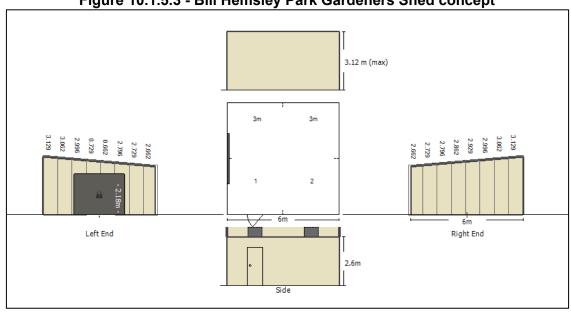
Bill Hemsley Park Gardeners Shed concept
